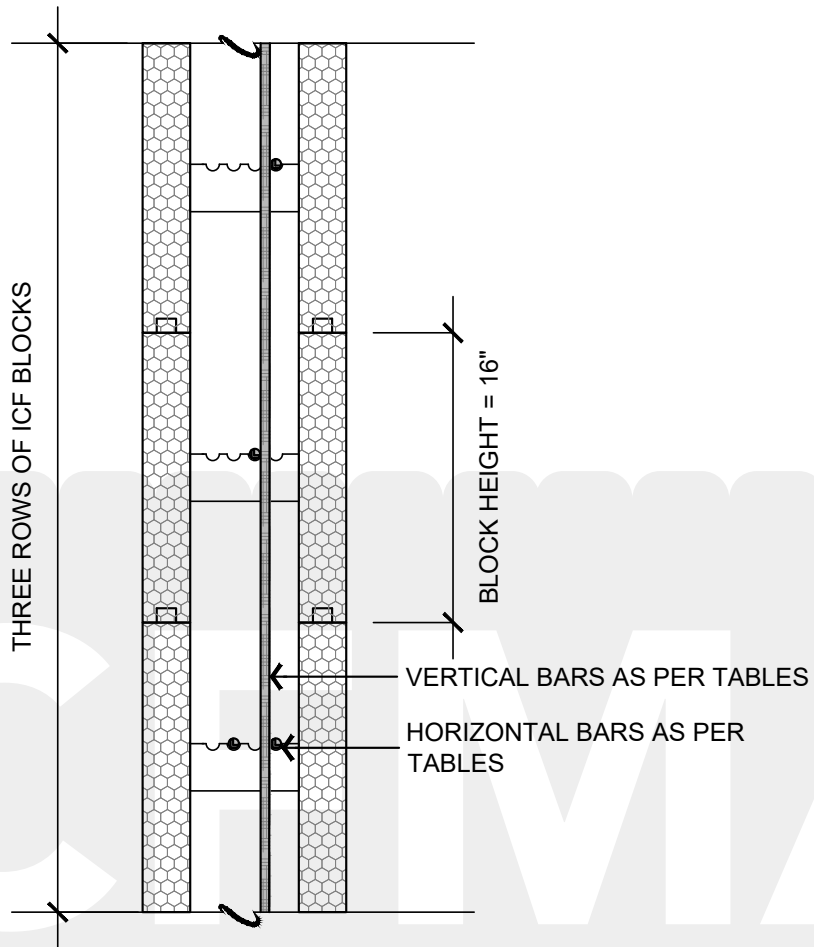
Above Grade Wall Reinforcing Placement for 12" Thick Walls.
